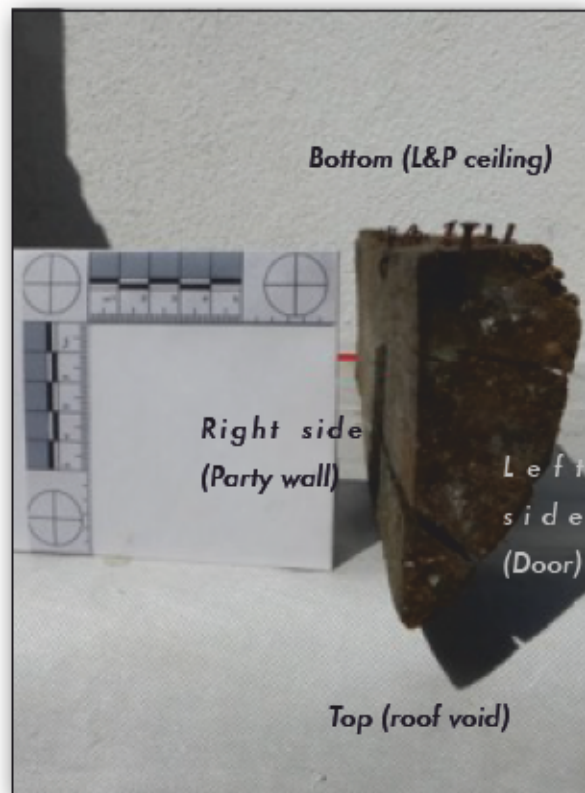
Removed ceiling joist timber (bedroom/bathroom partition end)
